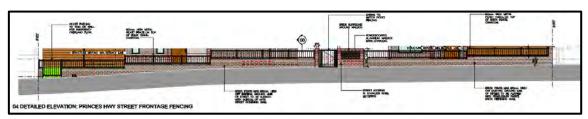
Prince Highway fence detail (A0112 - Fence Detail: JTA Architects)
